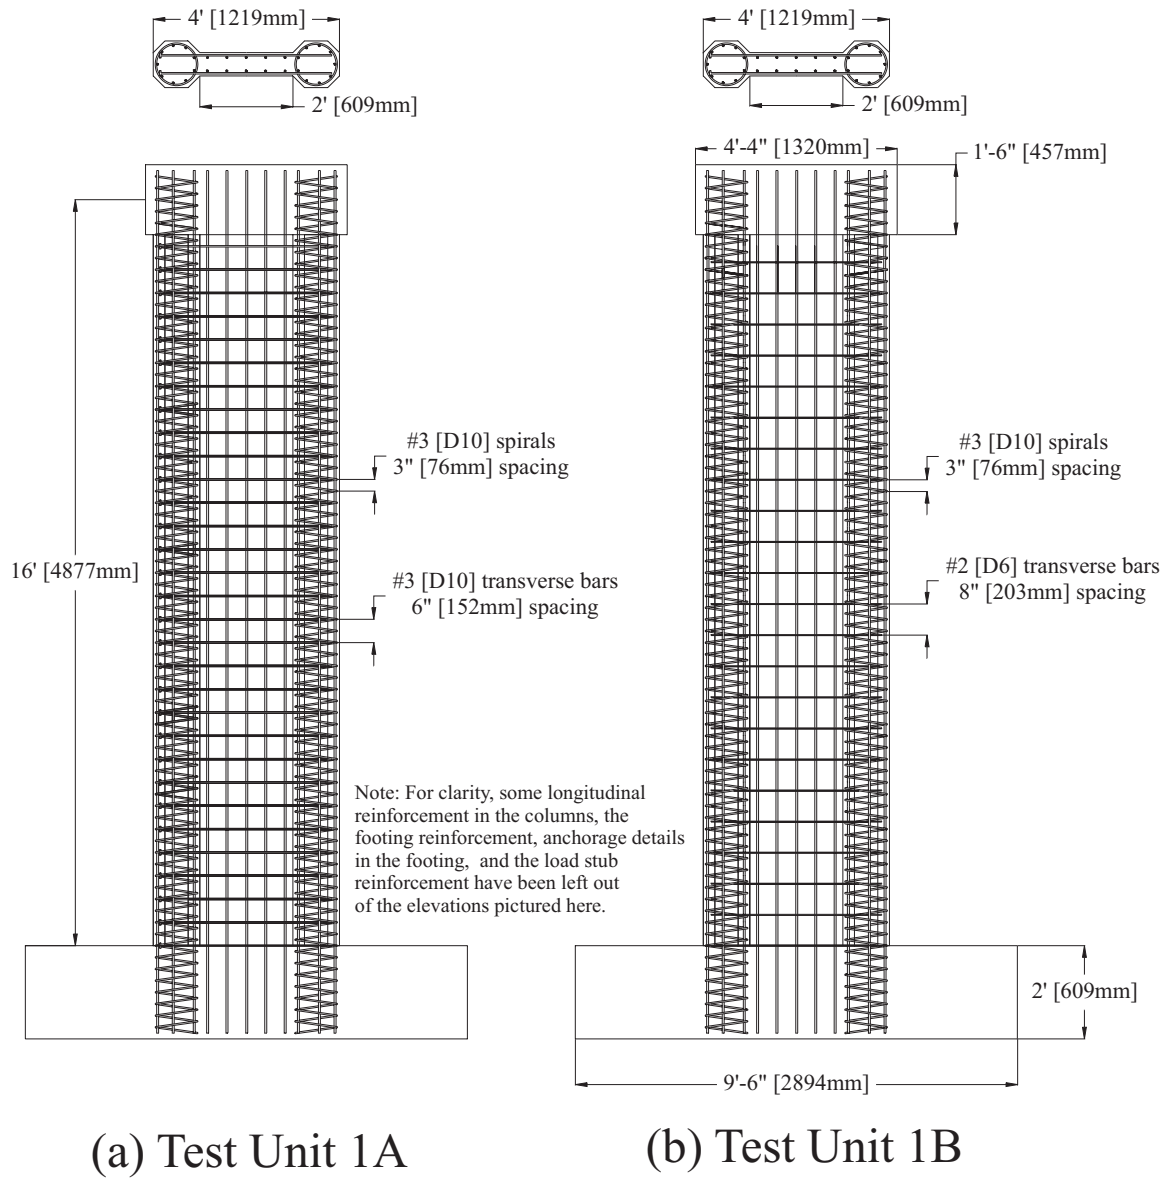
Test Units 1A (a) and 1B (b) with column reinforcement.
